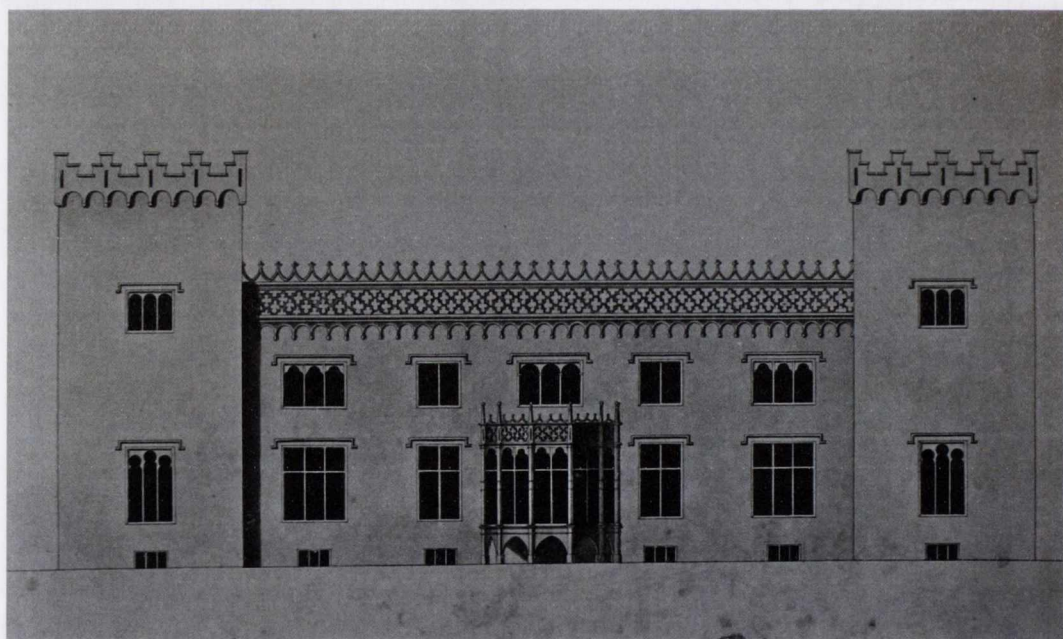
Proposed scheme for Charleville Castle, south elevation, John Pentland 1797, photograph IAA, A/6/11, courtesy of the Irish Architectural Archive.
